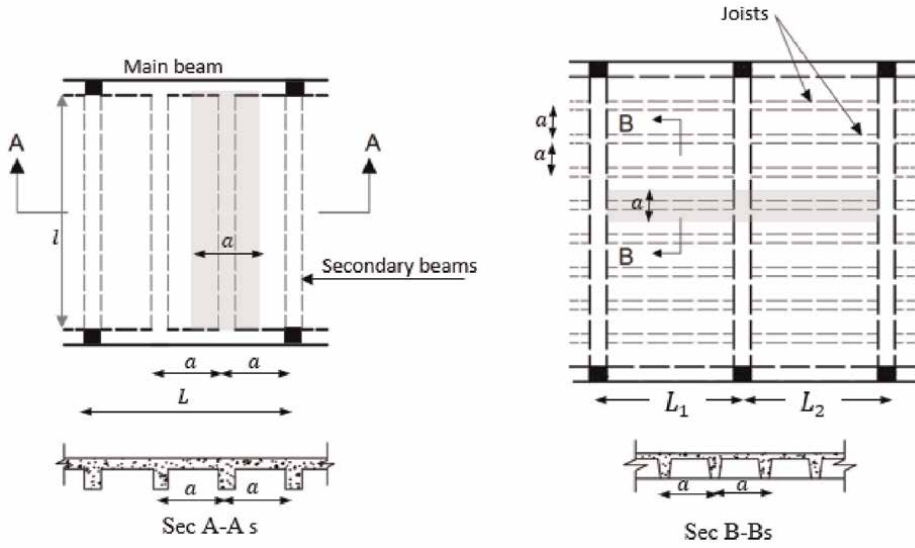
Distribution of gravity loads on secondary beams and joists in one-way slab. (a) Load on the secondary beam, one-way slab; (b) Load on the joists, joist/ribbed slabs.
